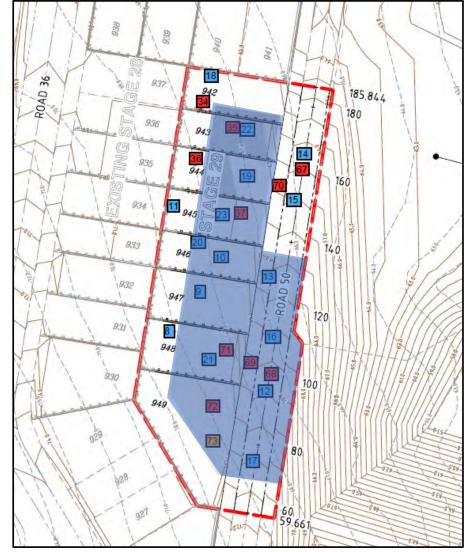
Bulk Earthworks Plan – Eden's Crossing Stage 27– Extent of Fill – Blue Shade
